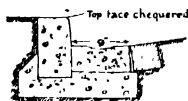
Pre-cast Concrete Kerb and Channel laid on Concrete Foundation.
